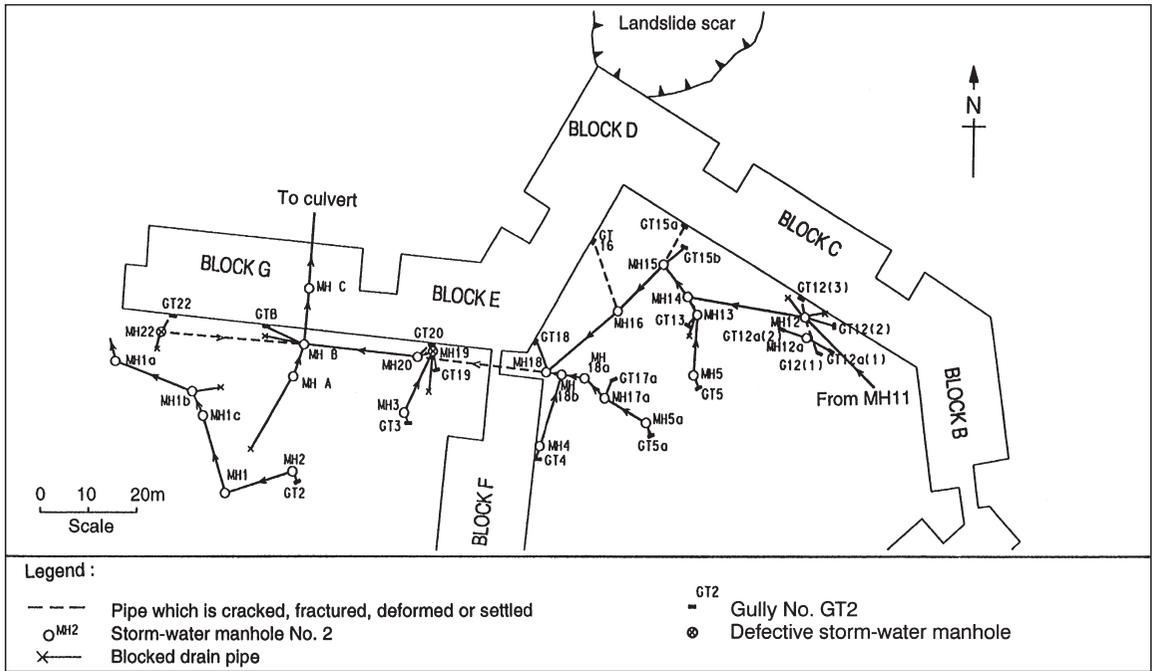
Layout and condition of the storm-water pipes at the time of the postfailure investigation. The drains between gully GT15a and manhole 15 and between gully GT16 and manhole 16 were found to suffer from major leakages
